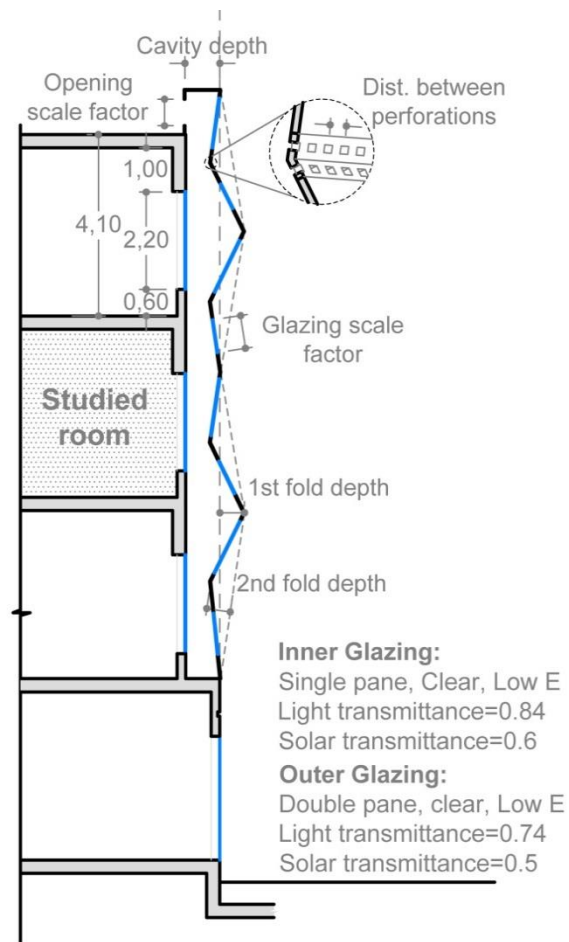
Schematic wall cross-section of the B-19 building with the folded DSF added to it. Source: author.
